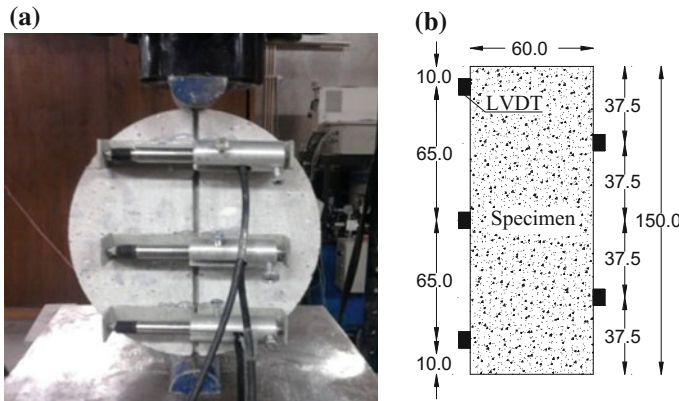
Geometry of the specimen and setup of the splitting tensile test (dimensions are in mm): a specimen front view (*top of the panel*), b specimen lateral view (Abrishambaf et al. 2016)
